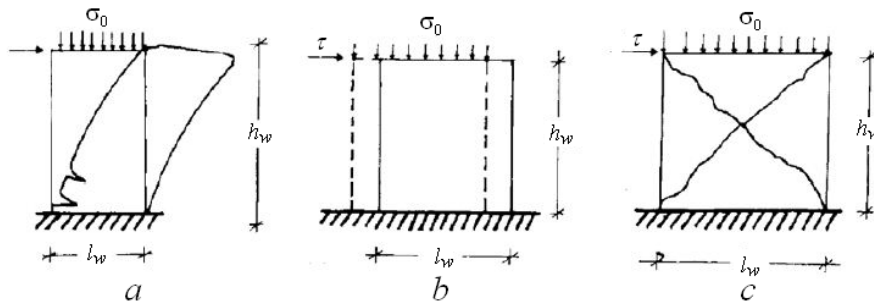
Failure mechanism of a masonry wall: *a* – rocking, *b* – sliding shear, *c* – diagonal shear cracking.
